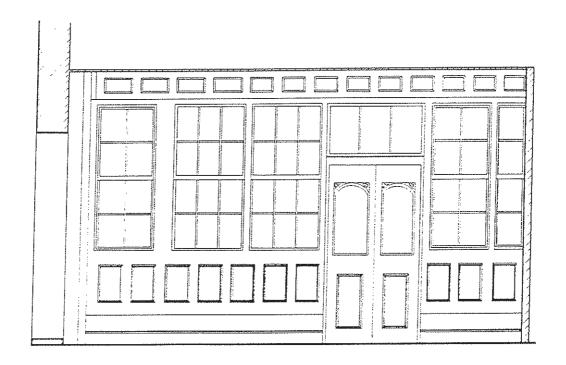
1920's glazed screen, 'Bottle bar', east facing elevation, (1:50)
